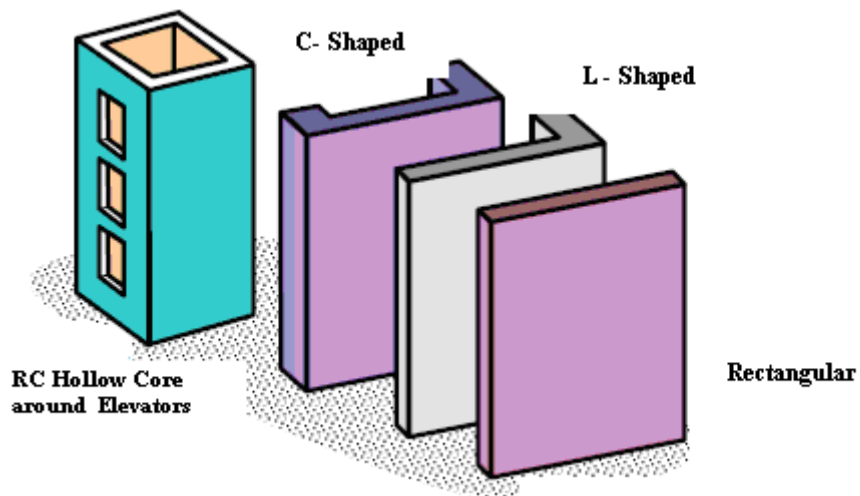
Different geometries Structural Walls in RC building (source: Murty 2004)
